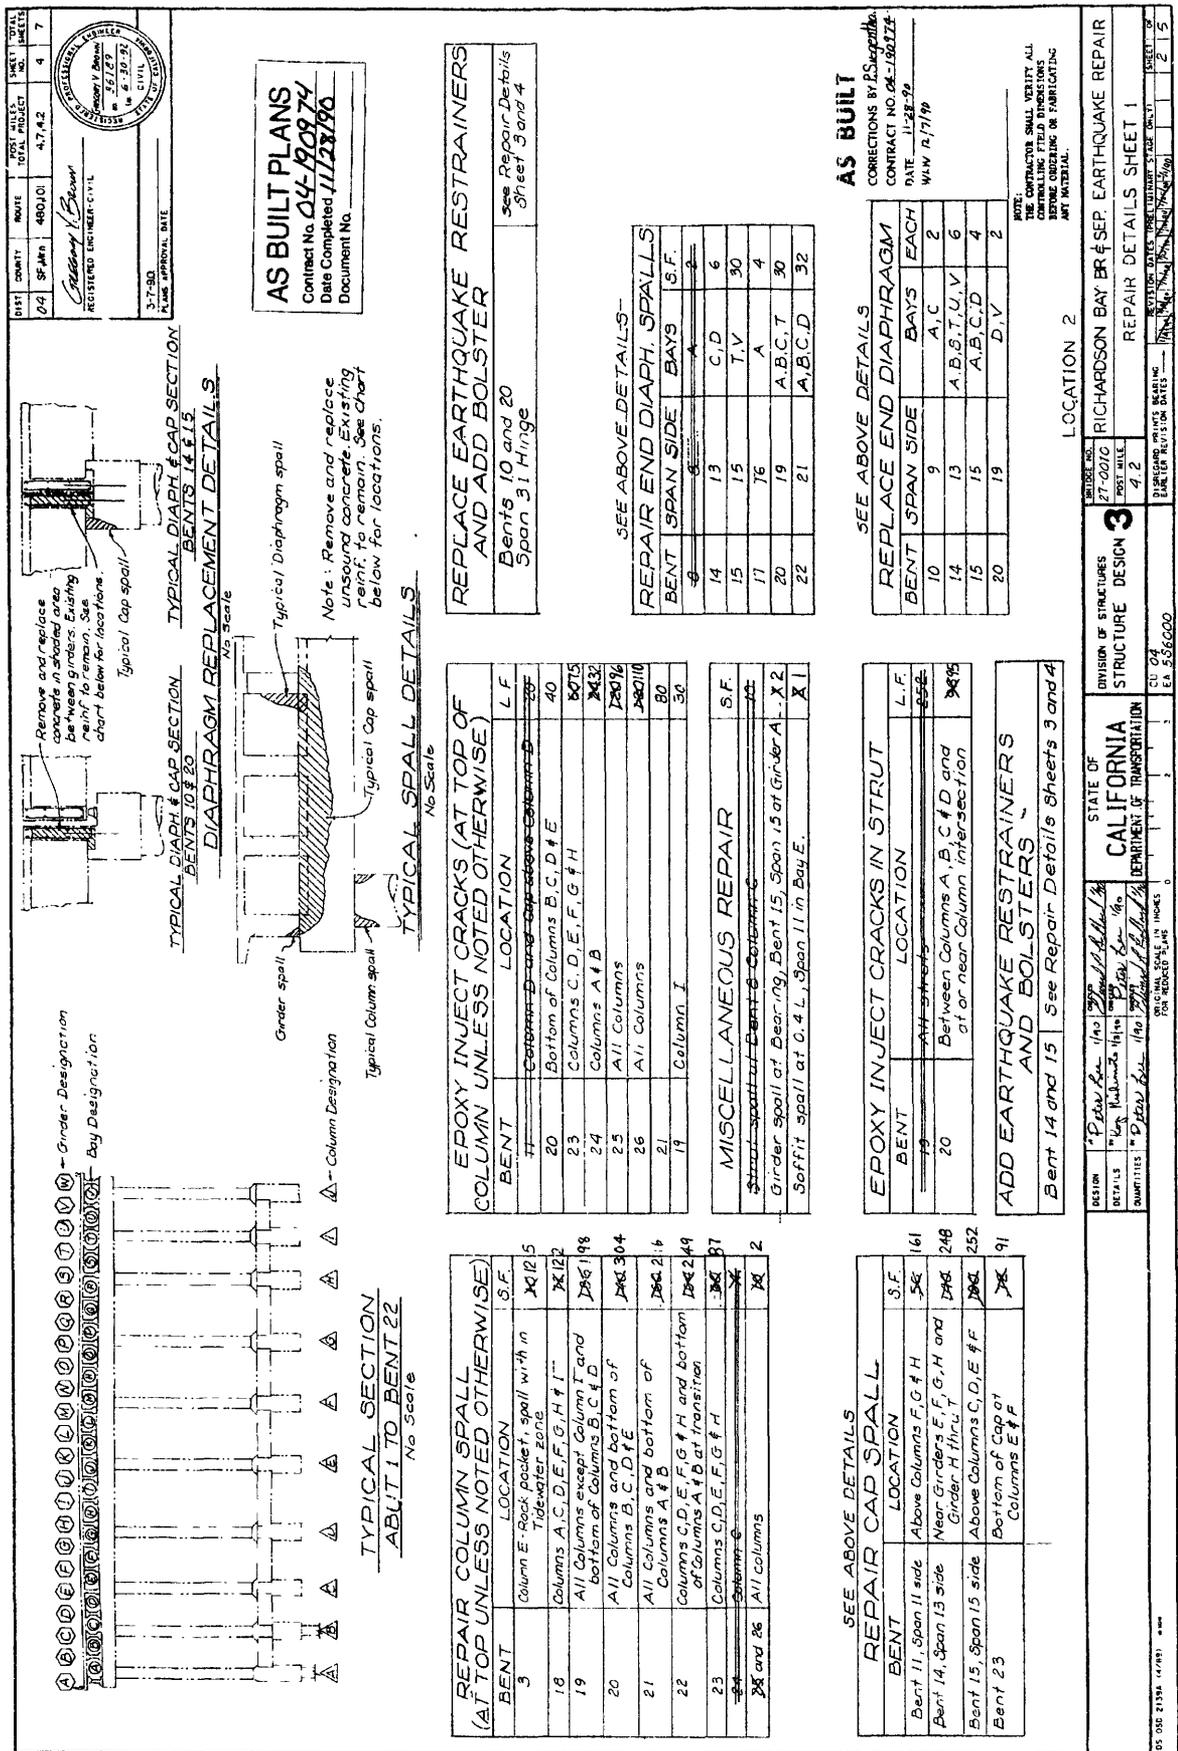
Earthquake repair drawing for Richardson Bay Bridge and Separation.
